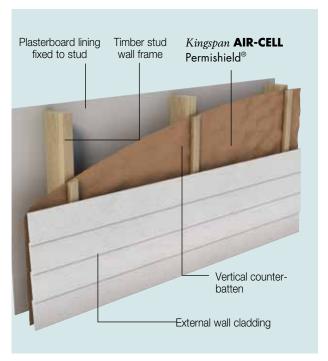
Kingspan AIR-CELL Permishield® in a timber-framed wall installation using counter-battens
